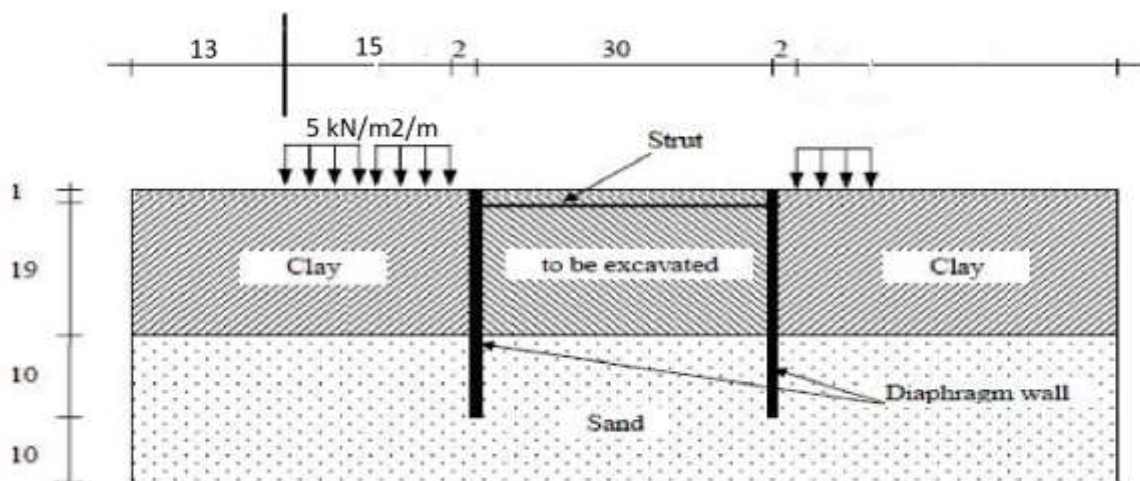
Configuration of the strut–diaphragm wall system with a uniform distributed load of 5 kN/m<sup>2</sup>/m applied at 15 m from the excavation and a wall spacing of 2 m.
